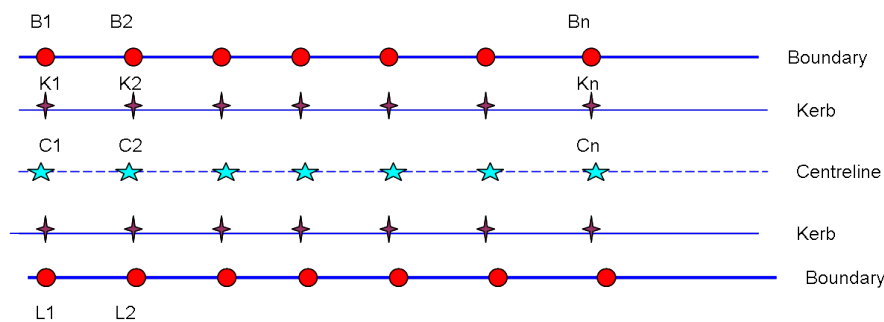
Planimetric view of a street segment with boundary, kerb and centreline points.
